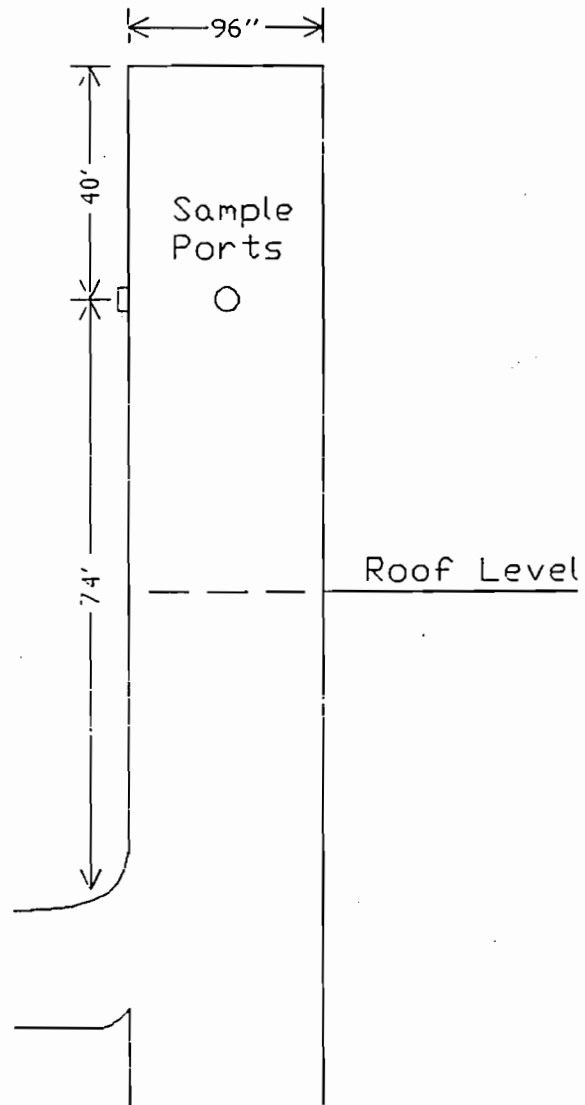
Stack Dimensions and sample port locations, Fort Pierce Utilities Authority, H.D. King Electric Generating Plant, Unit 8. Fort Pierce, Florida.
